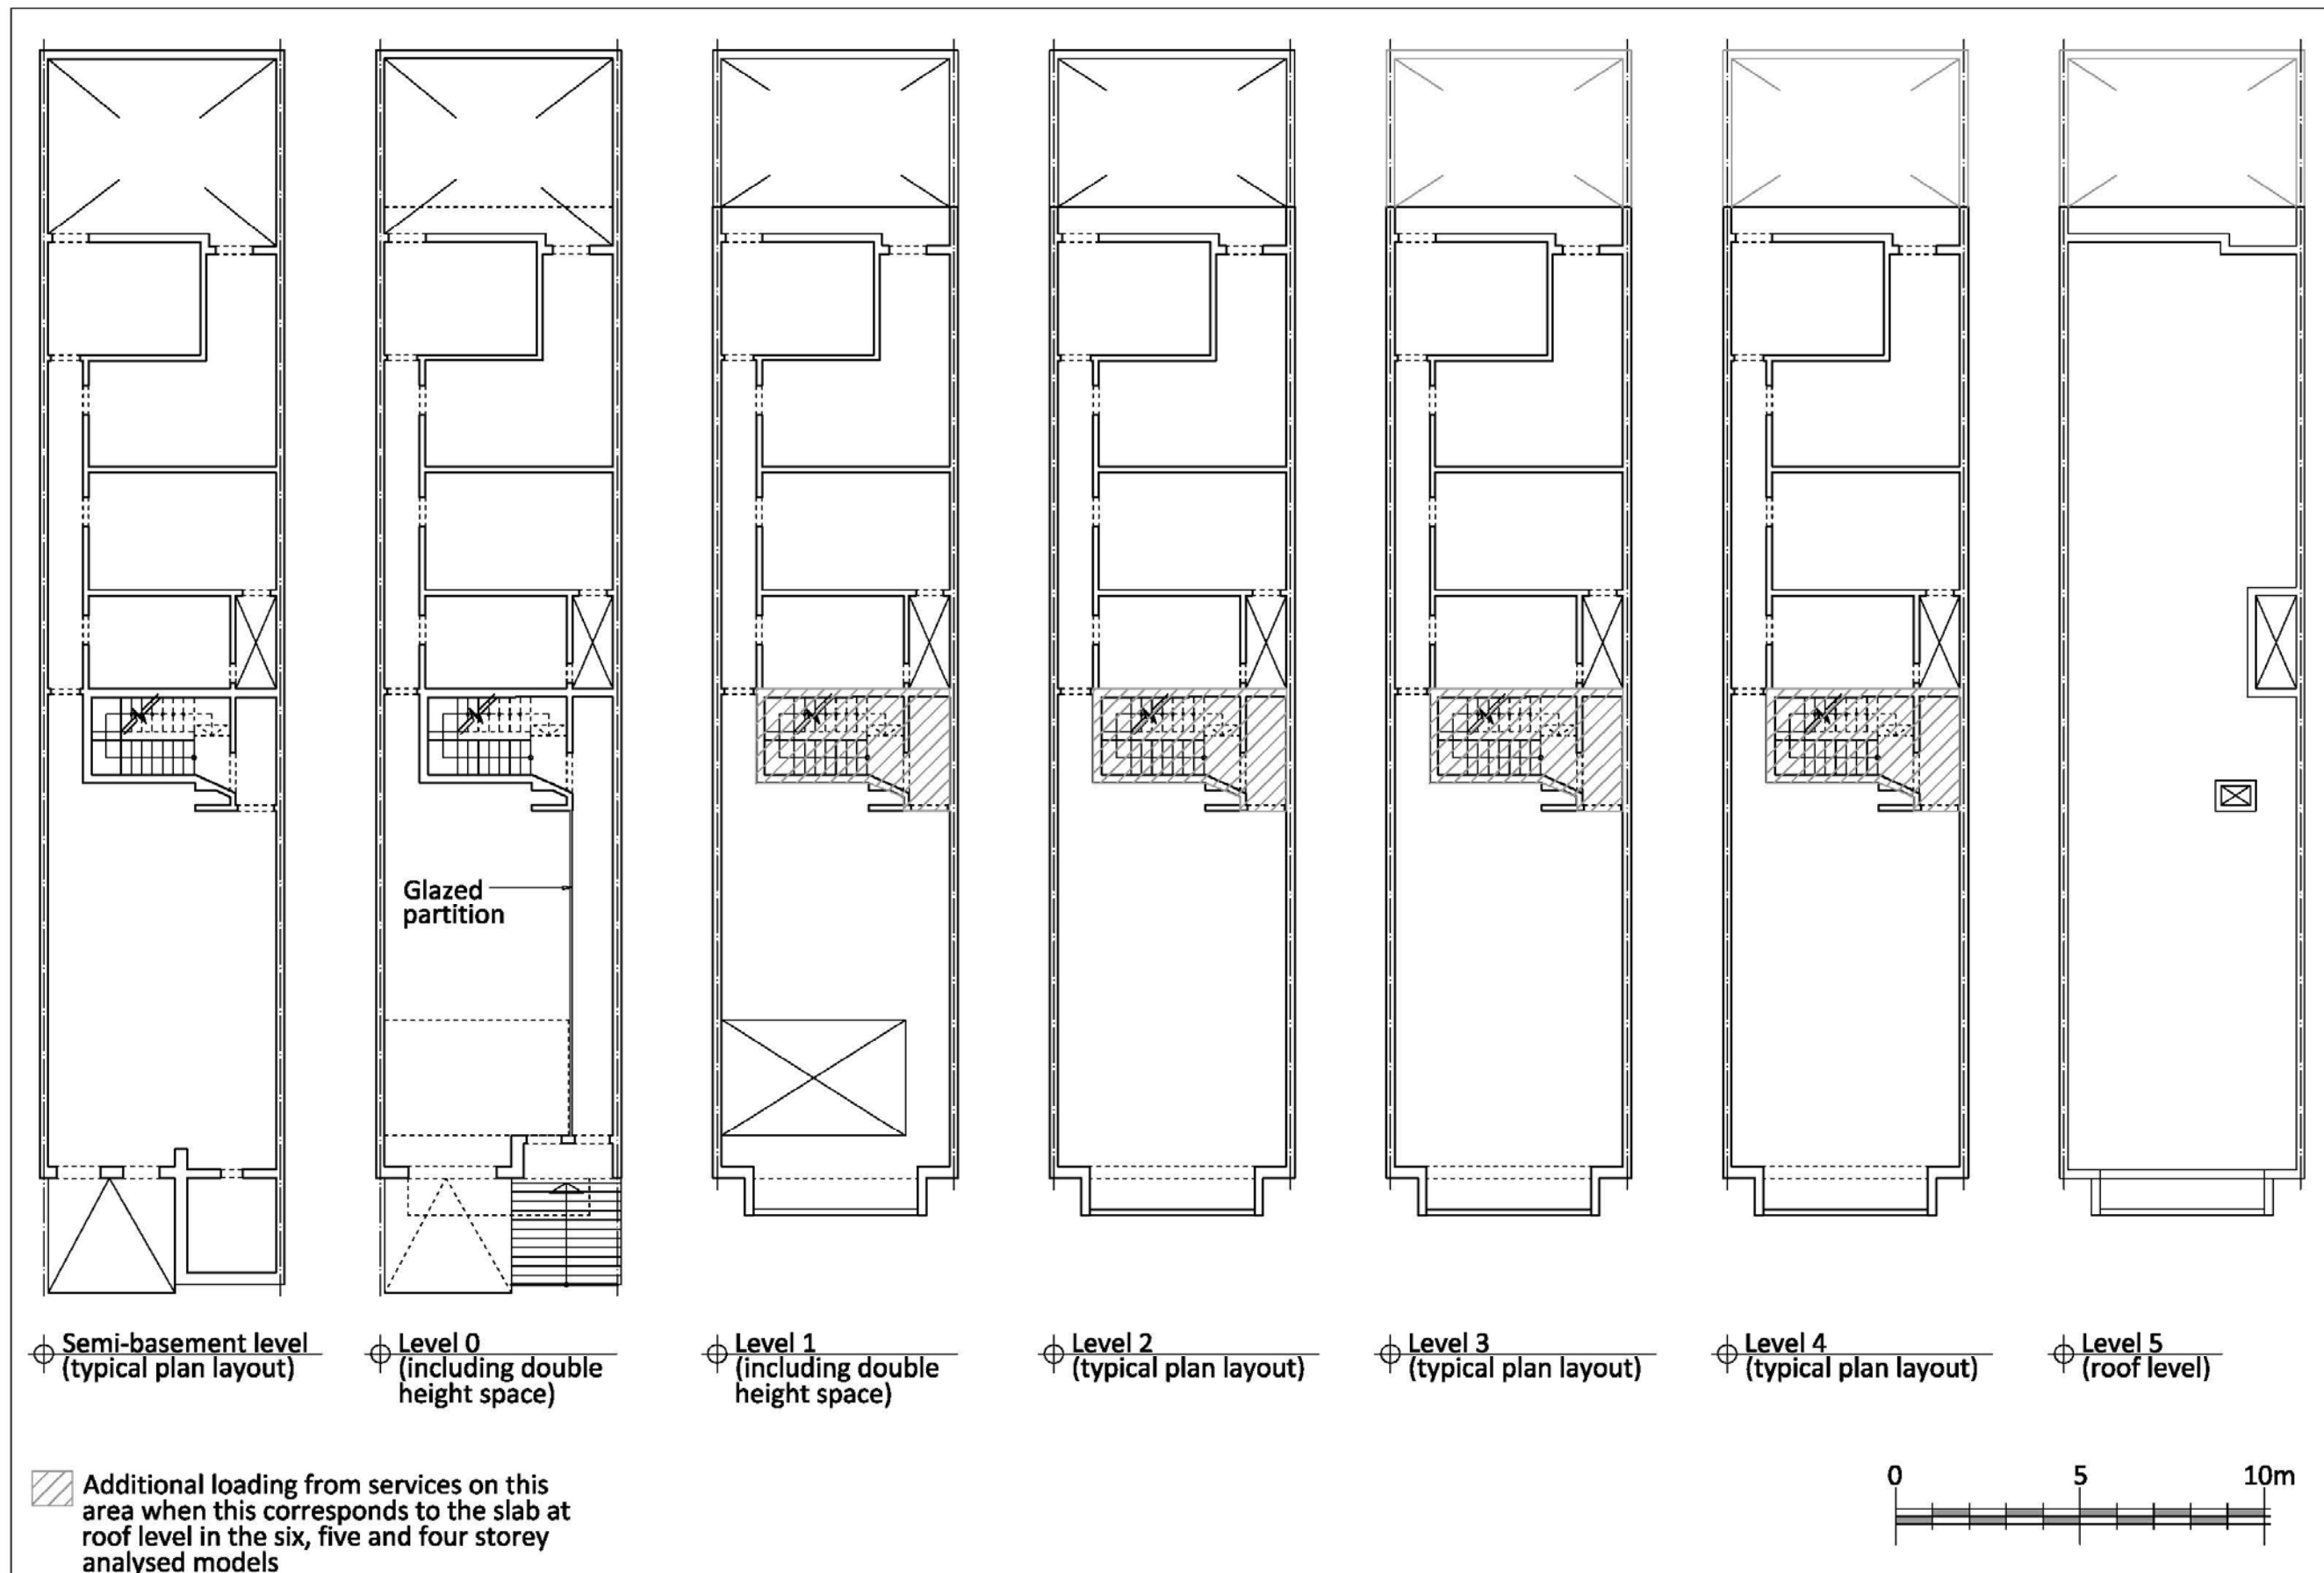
Plan layouts at all levels for analysed single building numerical models including a double height space between Levels 0 and 1 and with extended plan layout proportions (plan length-to-width ratio 4:1).
